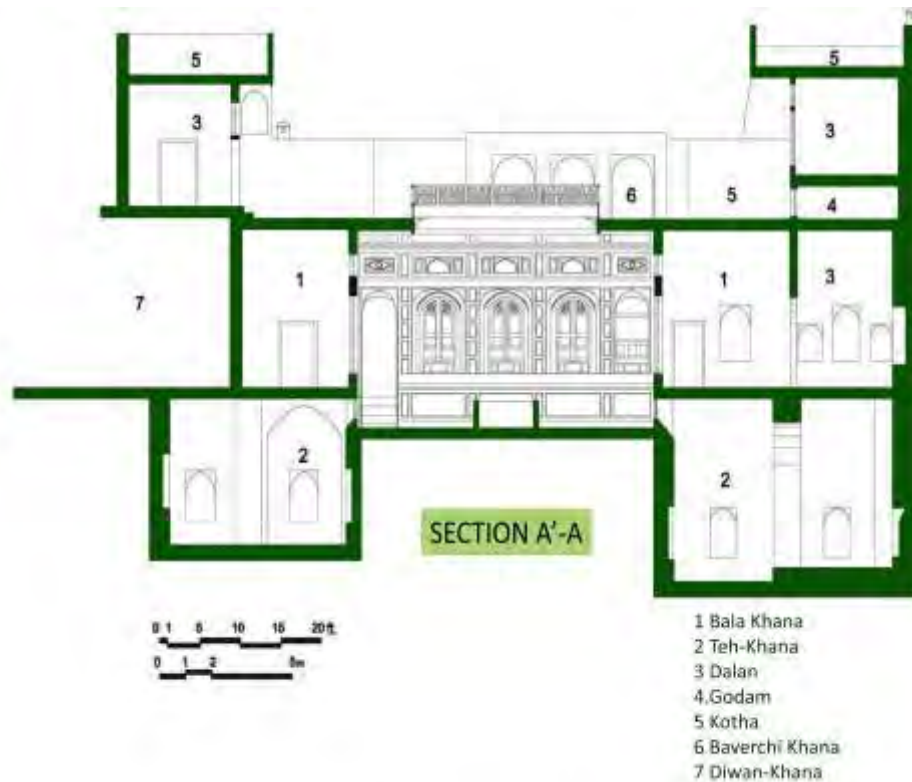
11 Cross section Plan of haveli courtesy S. khan
